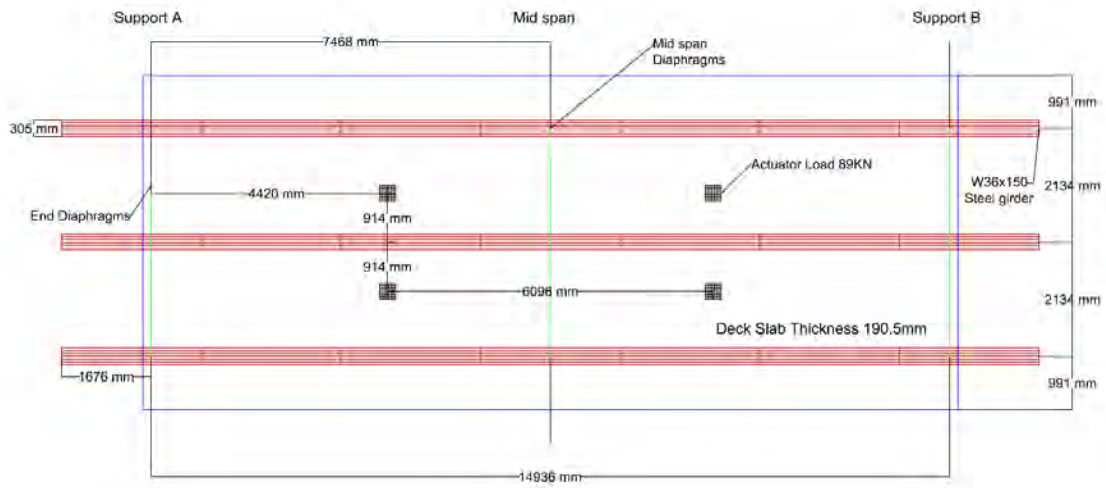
Full scale experimental bridge plan layout, Fang et al. [43]
